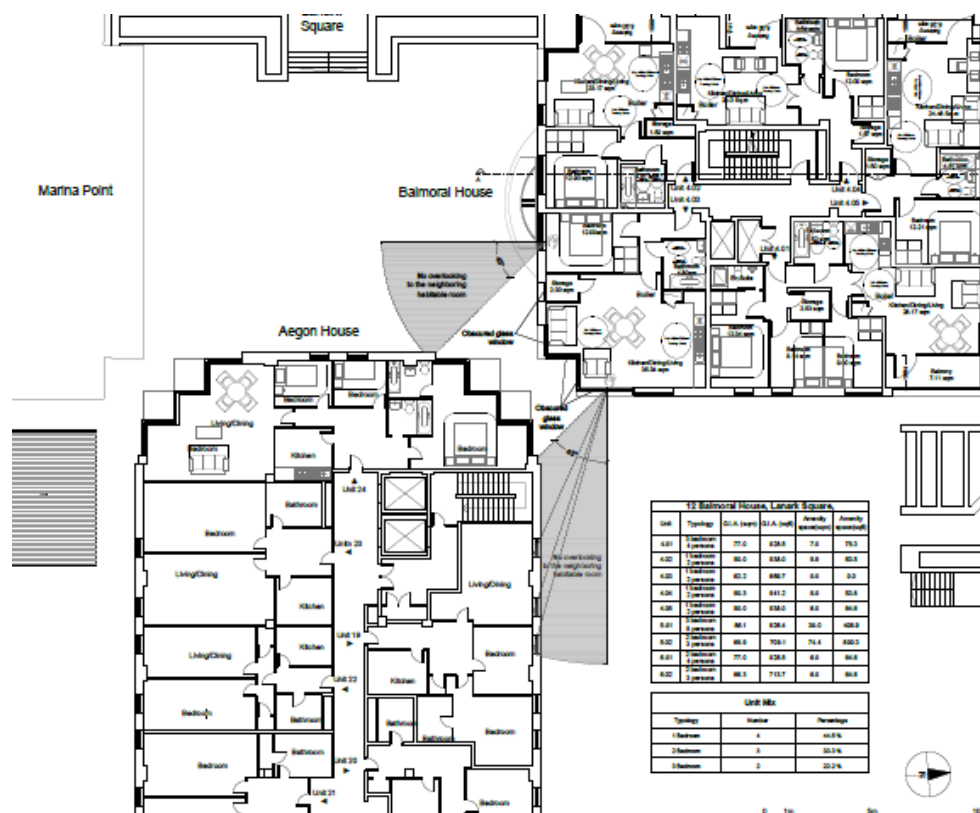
Relationship of the application building to Aegon House at 4th floor level
